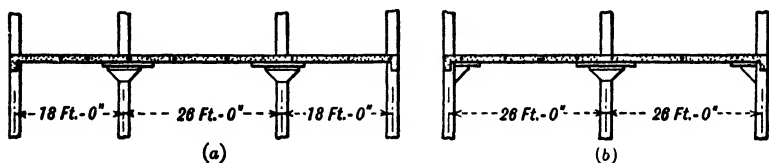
Section through Flat Slab Buildings. (See p. 326.)
